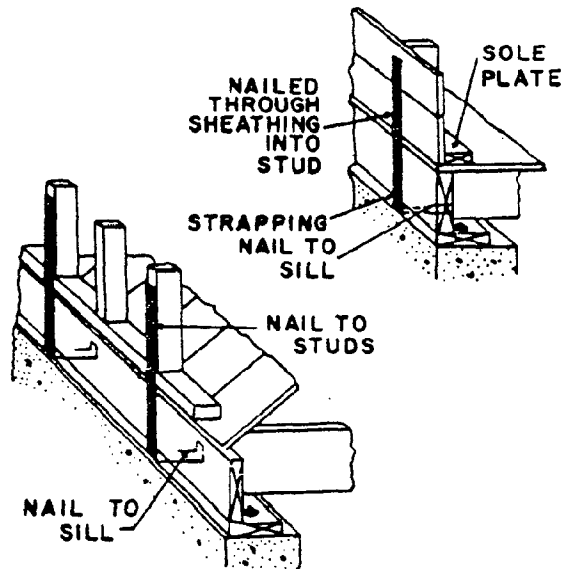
Foundation-to-wall connections: A, straps nailed directly to studs; B, straps nailed through sheathing into studs. From reference (15).
